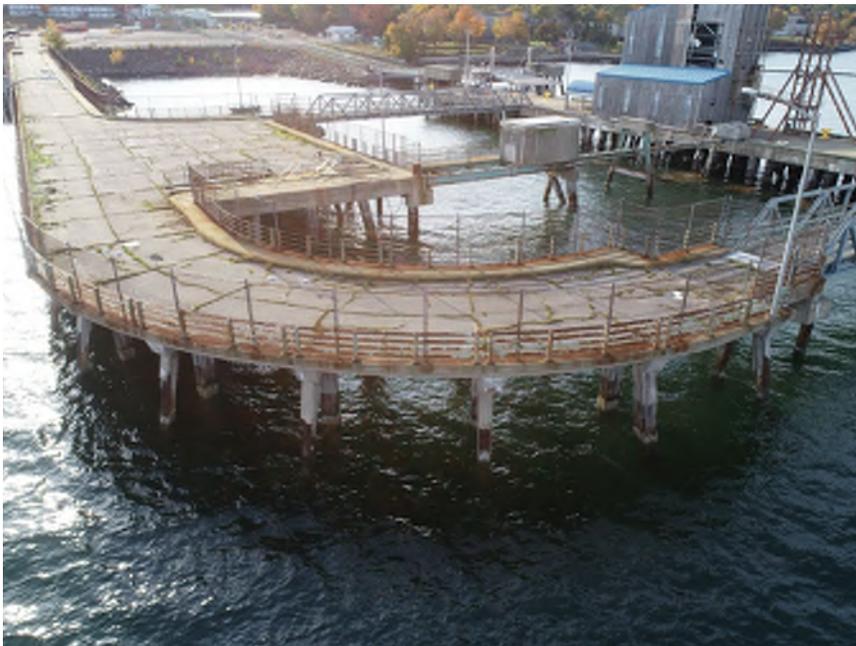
View of South Pier from the east. Taken by STH on 10/19/2020 at 3:11 PM.
